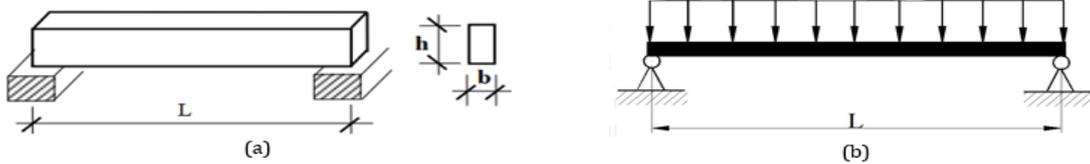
The calculation diagram of the concrete lagging in SVP steel arches. (a) The calculation model of concrete lagging in SVP steel arches; (b) Load diagram.
